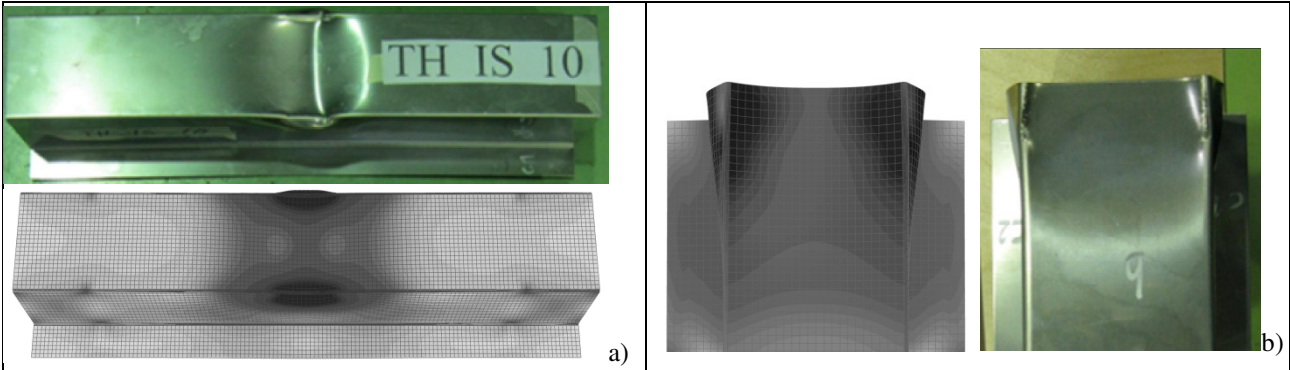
Typical web crippling failure modes in a) IOF loading and b) EOF loading
